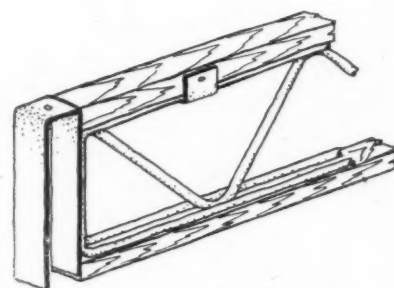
The Sommerfeld steel joist, made up from welded rod. The bracket shown on the end is for use with trimmers. (Stand L 235.)
